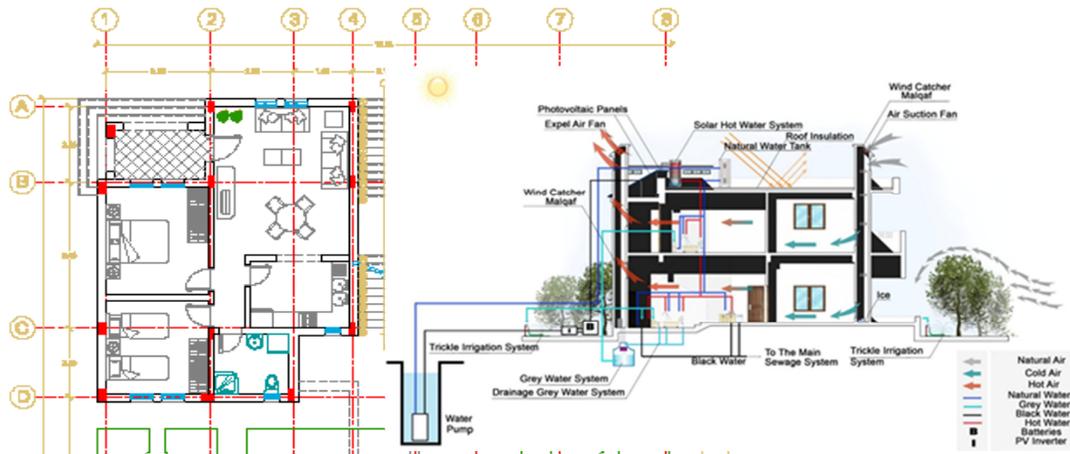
Ground floor plan & schematic section for an eco-house (made by the researcher)
